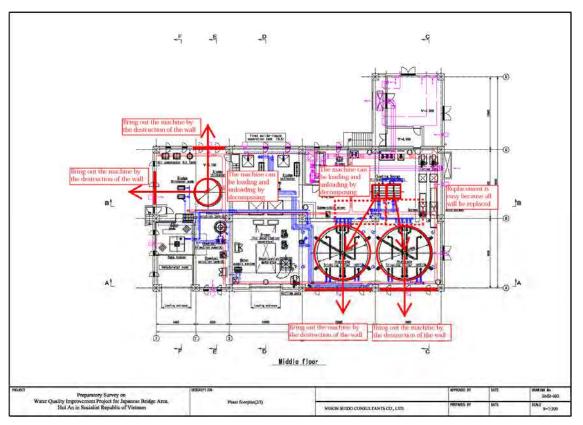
Transportation Route in the Case of Steel (Layout Plan)
